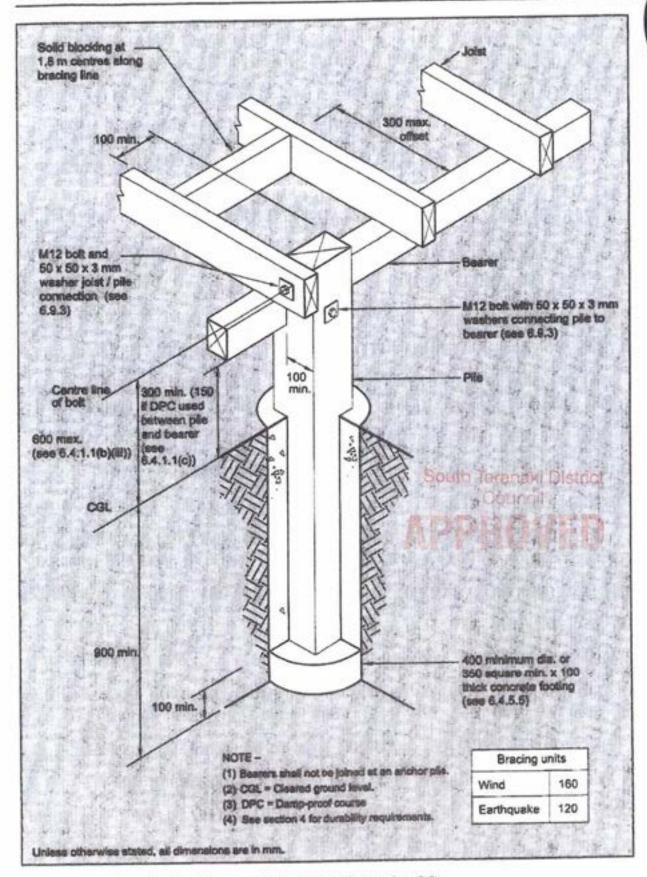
Anchor pile directly connected to joist and bearer (see 6.9)
